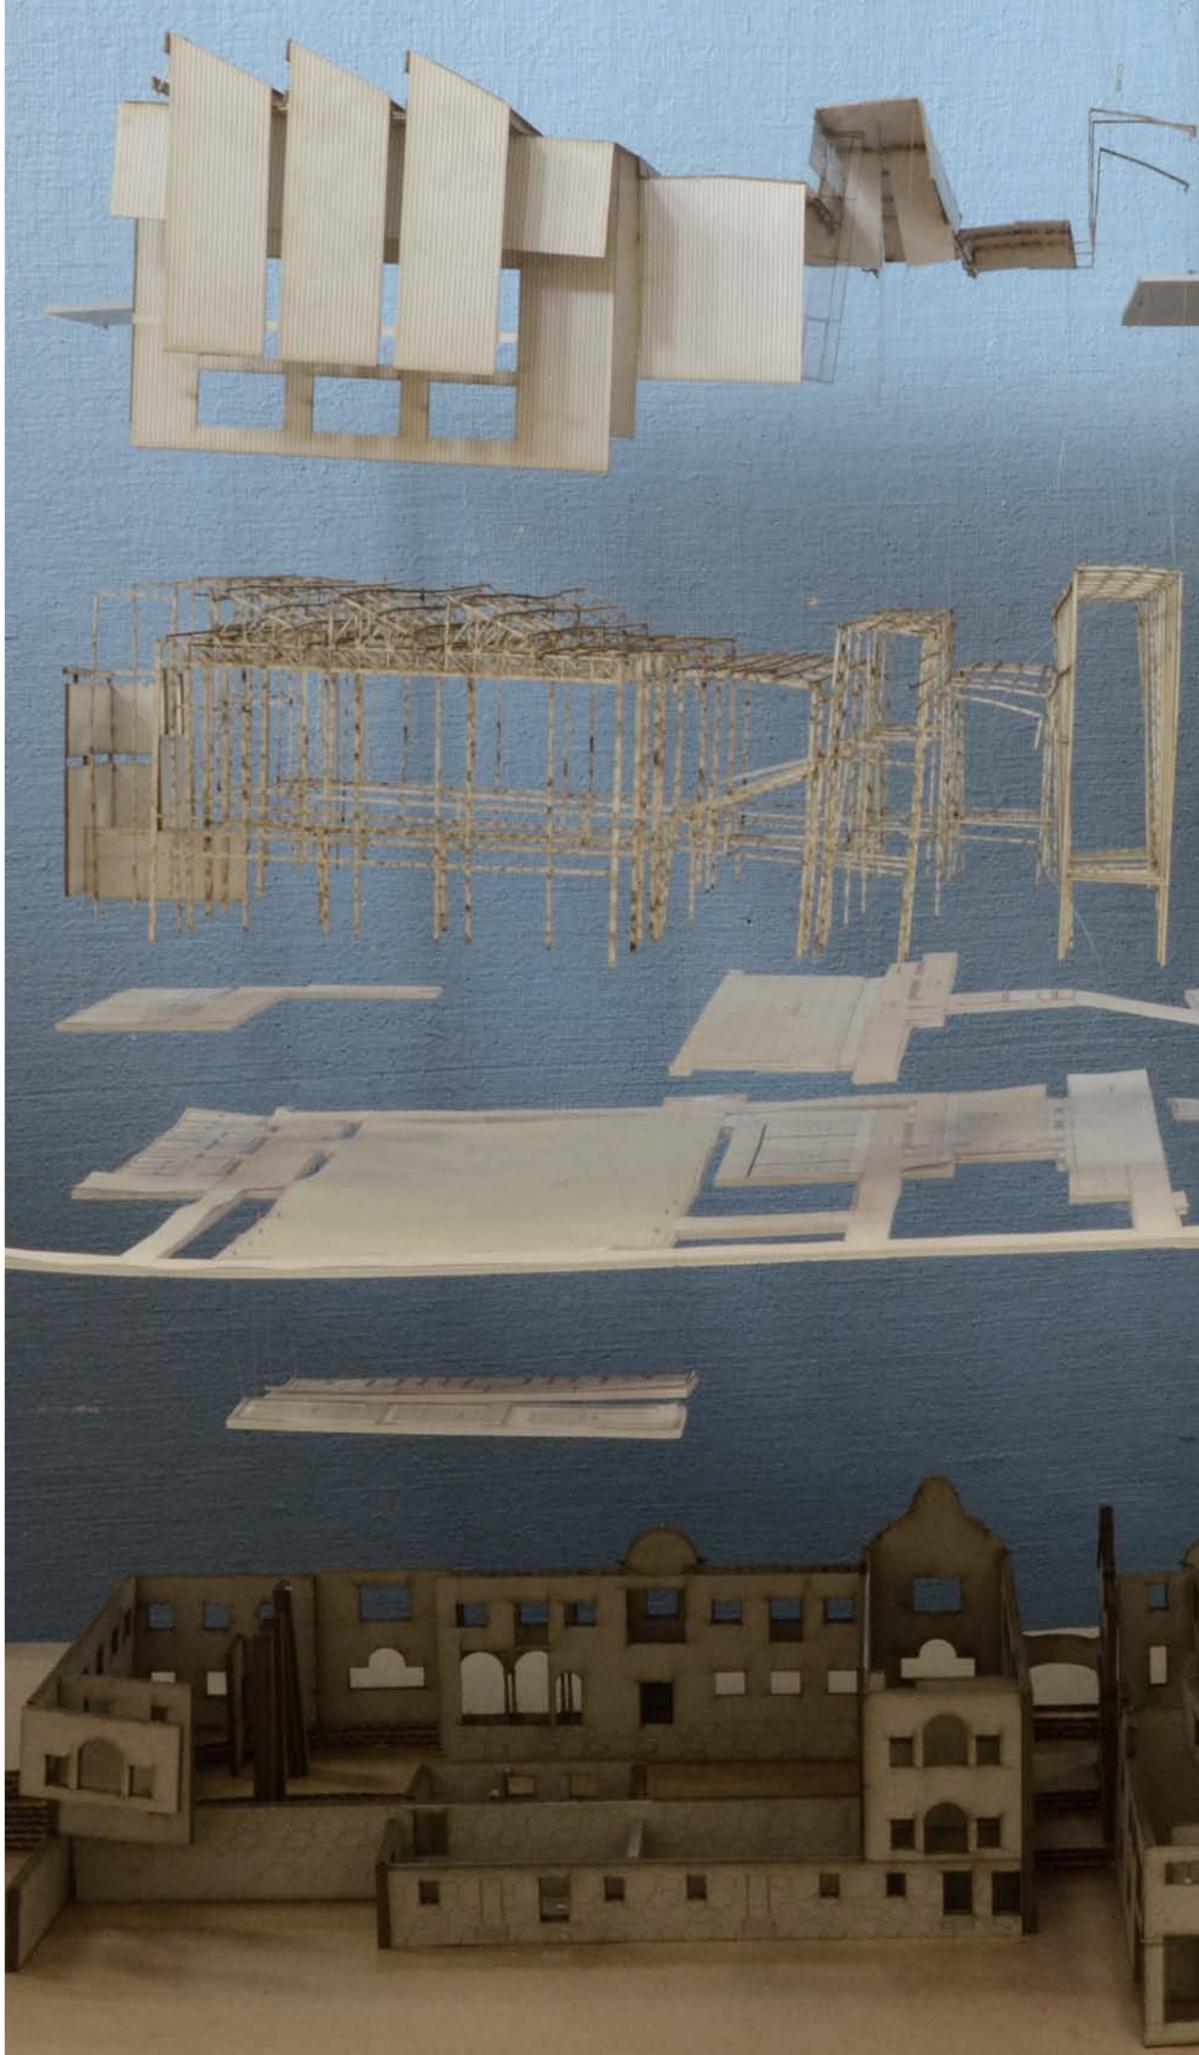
Model 1: suspended and exploded model - southern building - eastern elevation (Author November 2013)
